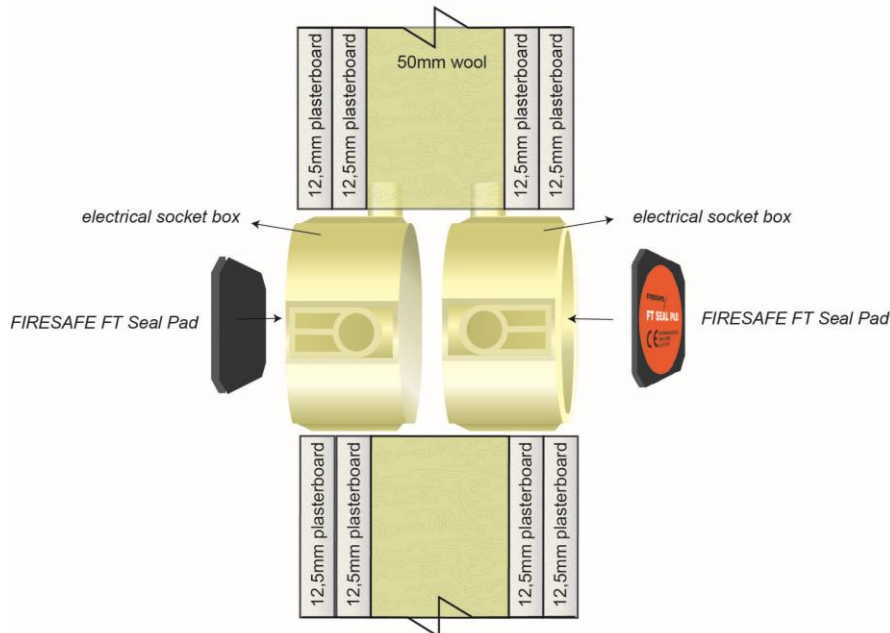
Two electrical wall boxes in flexible wall, fitted back to back – sectional view
